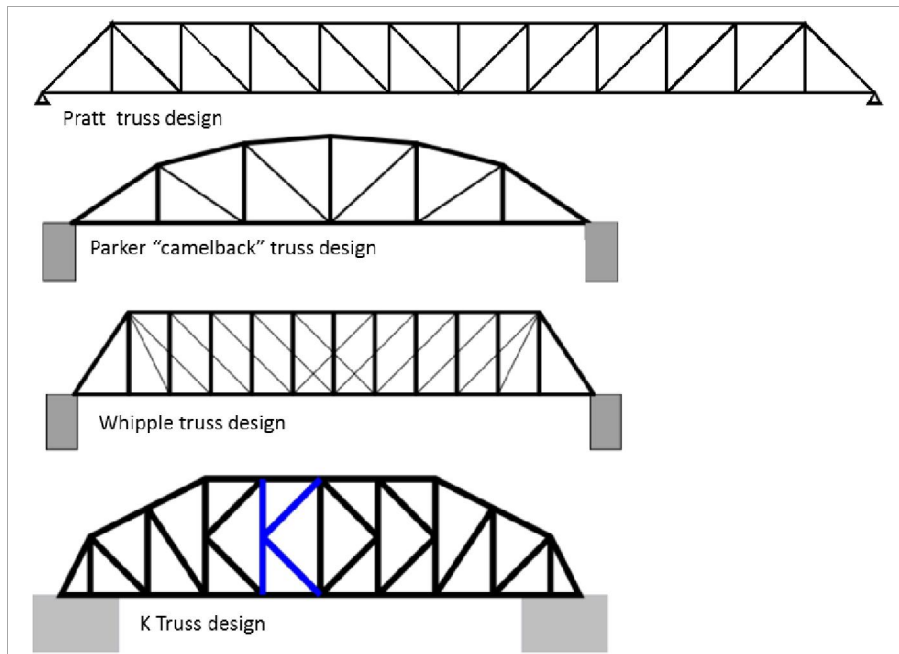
Truss bridge designs. Many of the newer truss designs are based on the original Pratt truss design. Figure based on Wikipedia drawings
